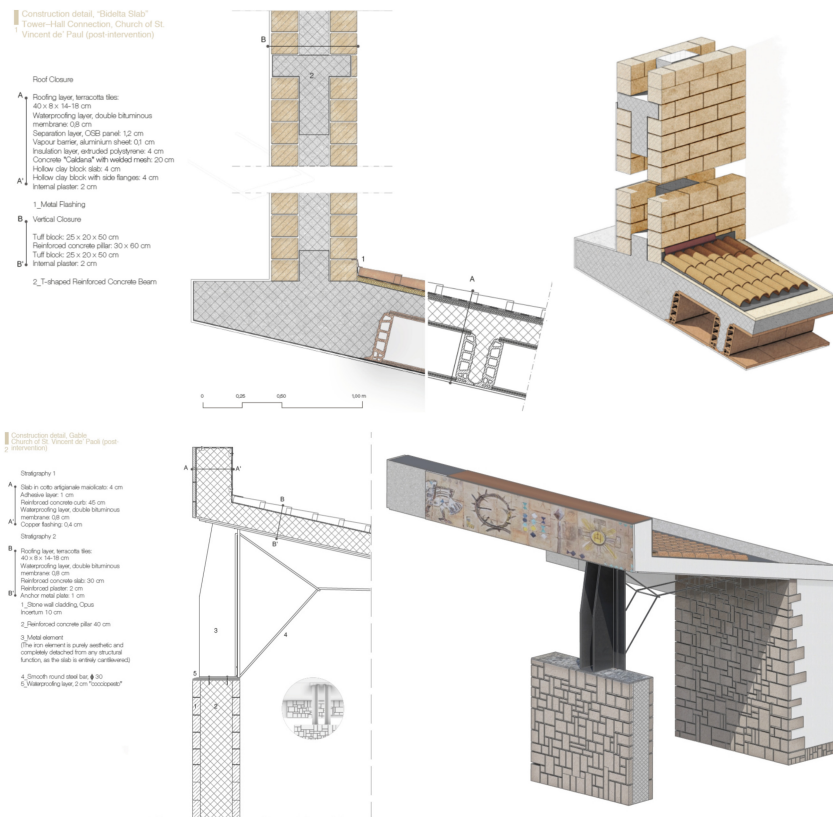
Above: Construction detail, “Solaio Bidelta” Tower-hall detail (post-intervention) section and axonometric view; below: Construction detail, gable of the church (post-intervention) section and axonometric view (elaborations by the authors).
